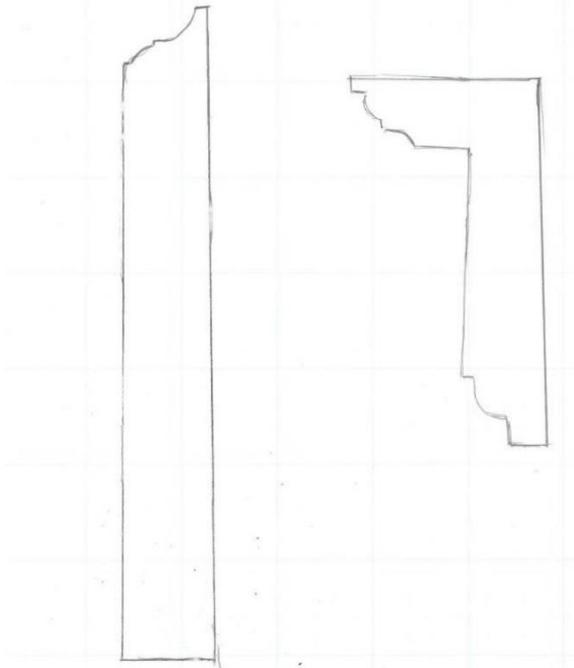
Typical profiling of baseboard (left) and chair rail (right) observed.
